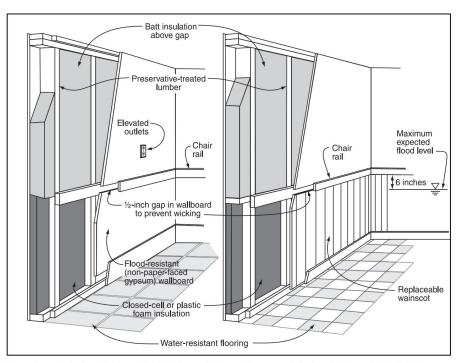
Partial wet floodproofing technique using flood damage-resistant materials for finished wall construction.
